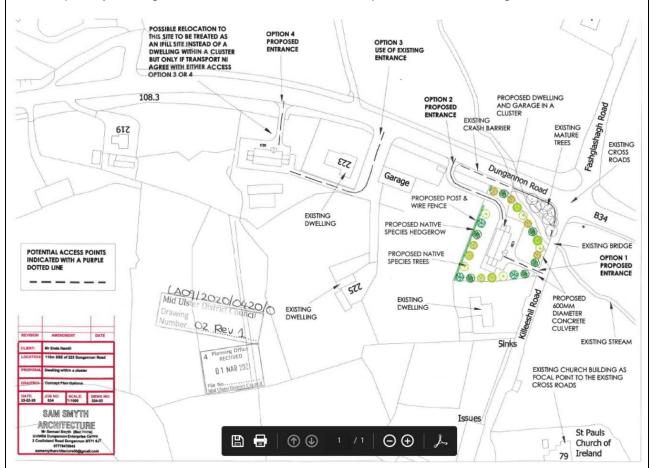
Concept Plan of Alternative access off the Dungannon Road.
